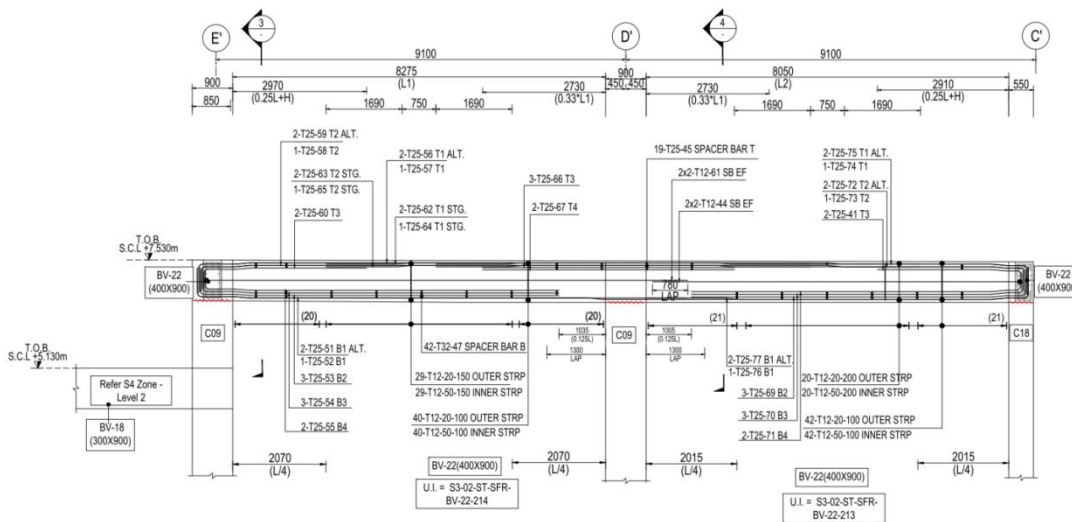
Long Sectional Elevation of Beam BV-22 showing Reinforcement Layout
